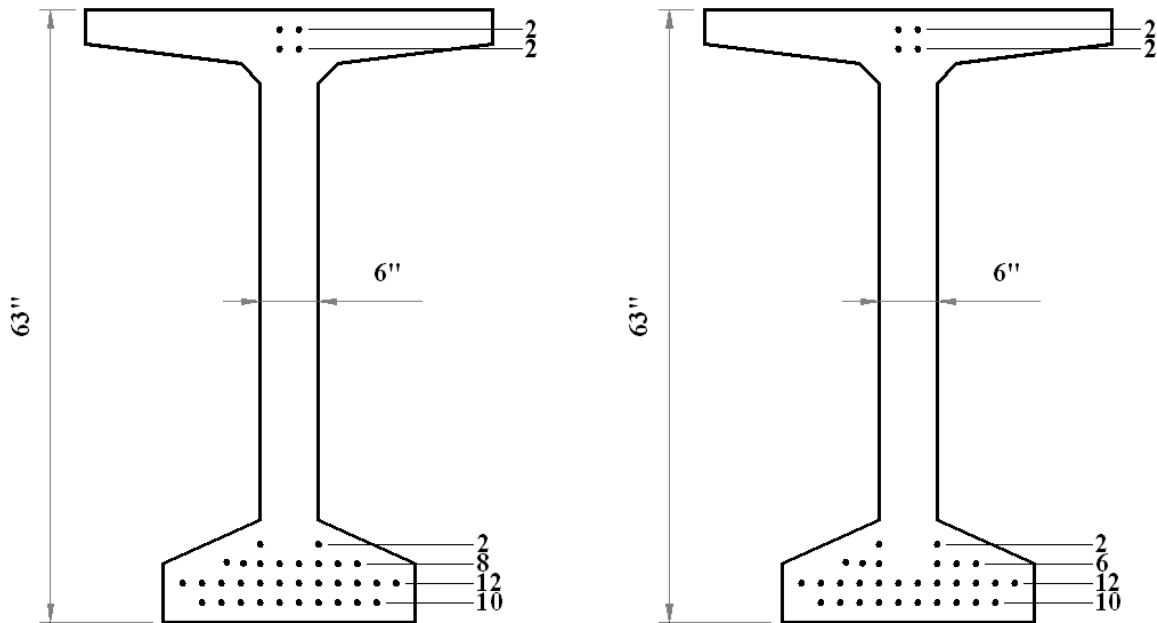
End View Cross-Section of BT-63 Girder with 34 - 0.7 in. (18 mm) Strands Employing UHPC.
